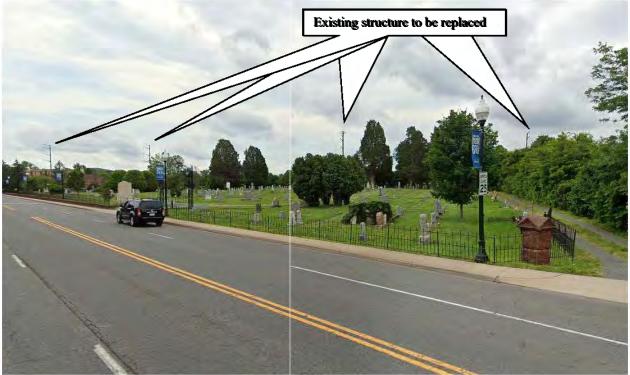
Photo location 2- View from west end of cemetery (Multiple existing project structures visible), facing southeast.
